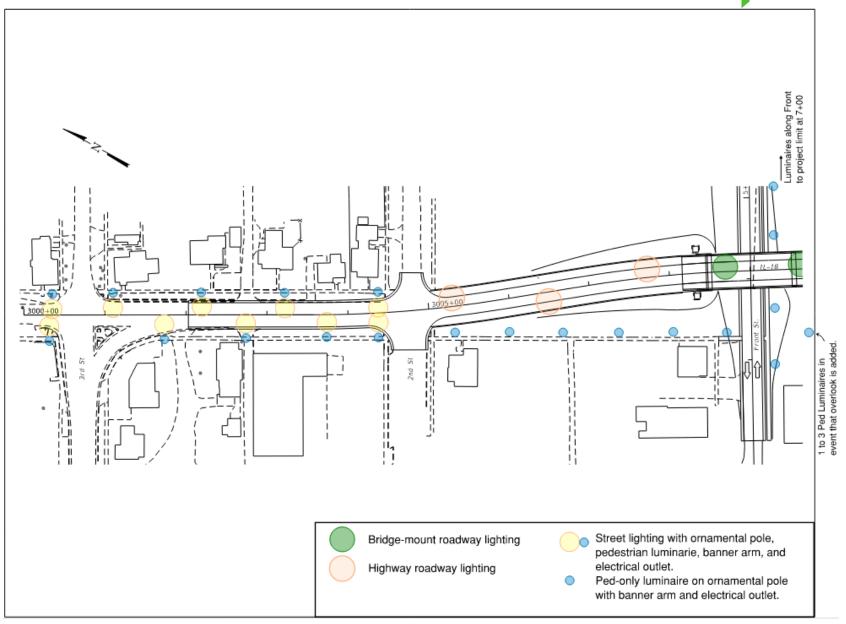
FOR INSTANCE: ENHANCED ROADWAY AND SIDEWALK LIGHTING
